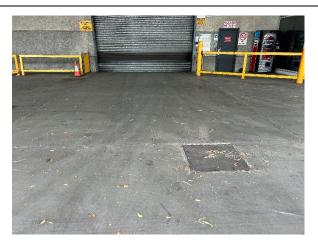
Southern truck loading area, adjacent bay 546 – unknown pits.
